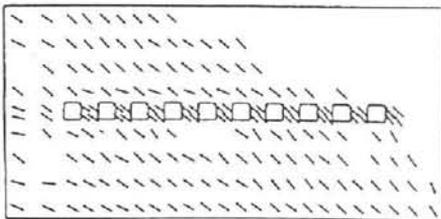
Crack Pattern of Shear Wall with Many Openings [2-31]
